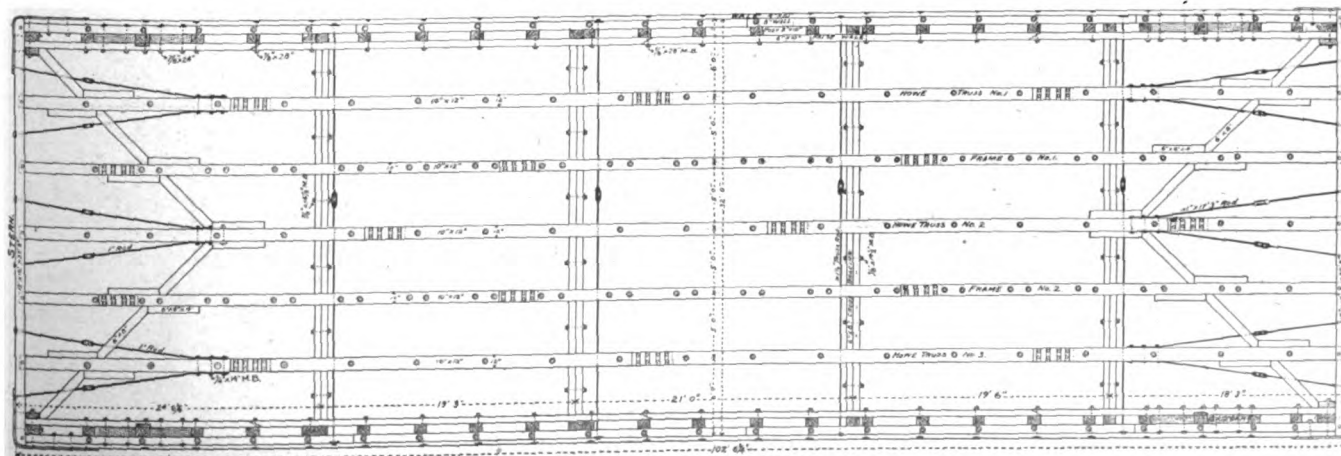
Plan of scow showing walls, trusses, frames, etc.
